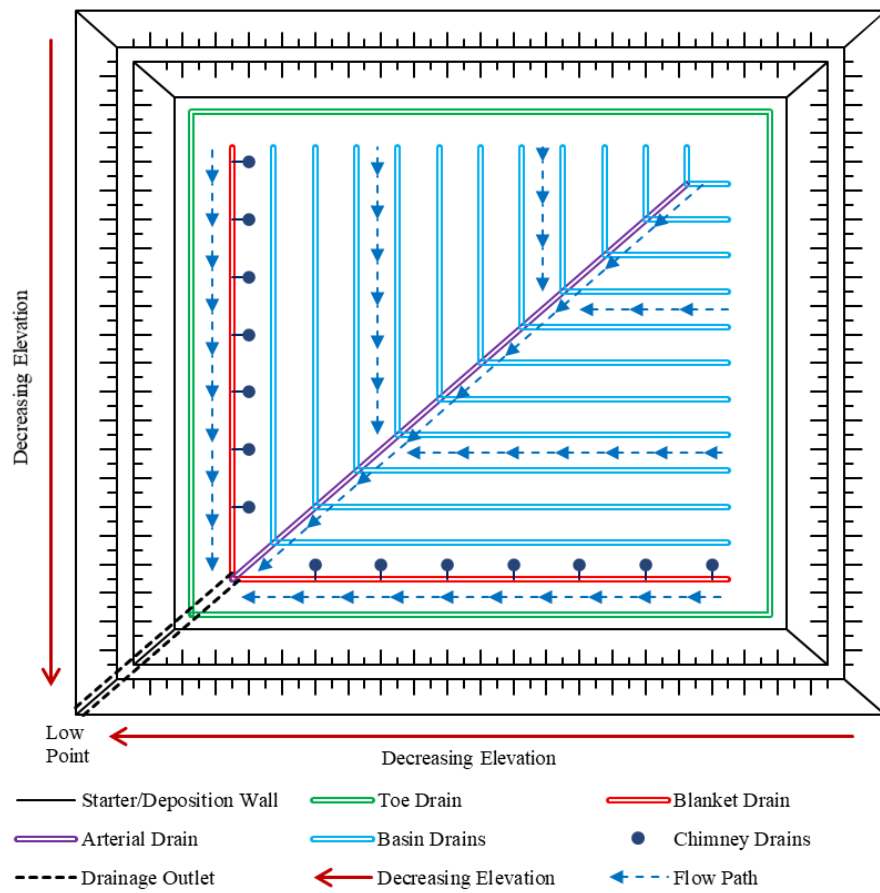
Typical above-liner drainage layout of a HDPE-lined TSF
